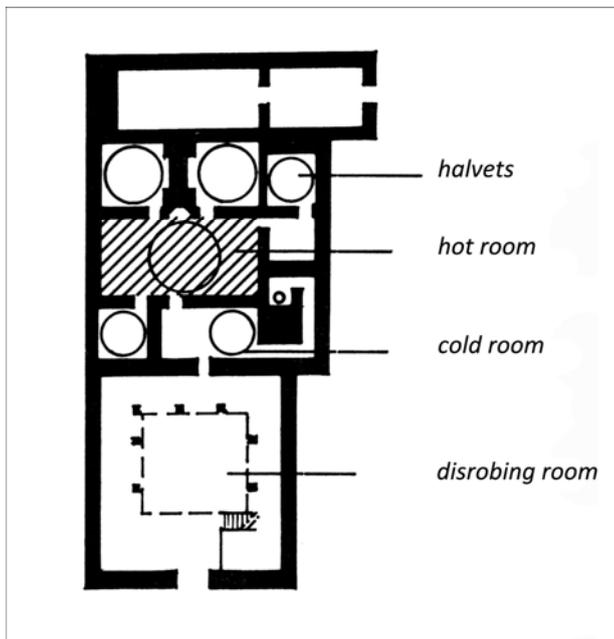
Floor plan of Orta Mezar (Yeni) *hamamı*, plan after M. Harbova
